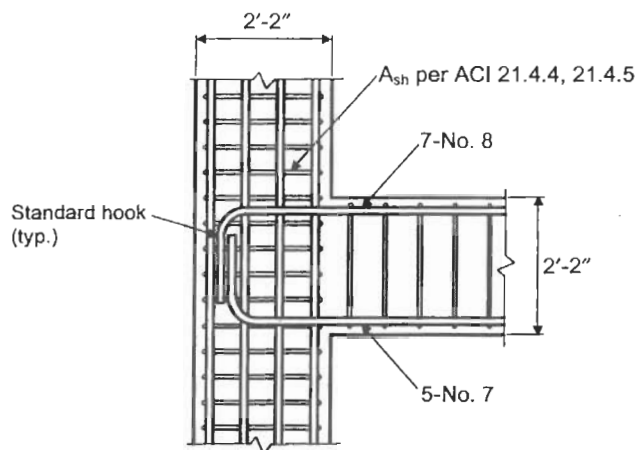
Reinforcement Details at Exterior Beam-Column Joint (SDC D)
